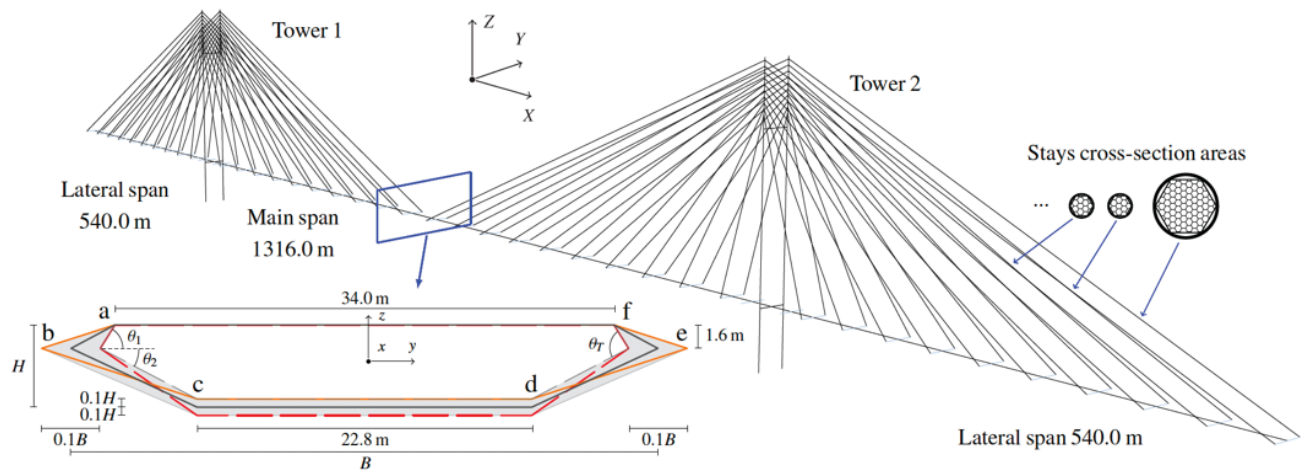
Layout of the cable-stayed bridge adopted as application example showing the deck shape variations considered in the aero-structural design optimization.
